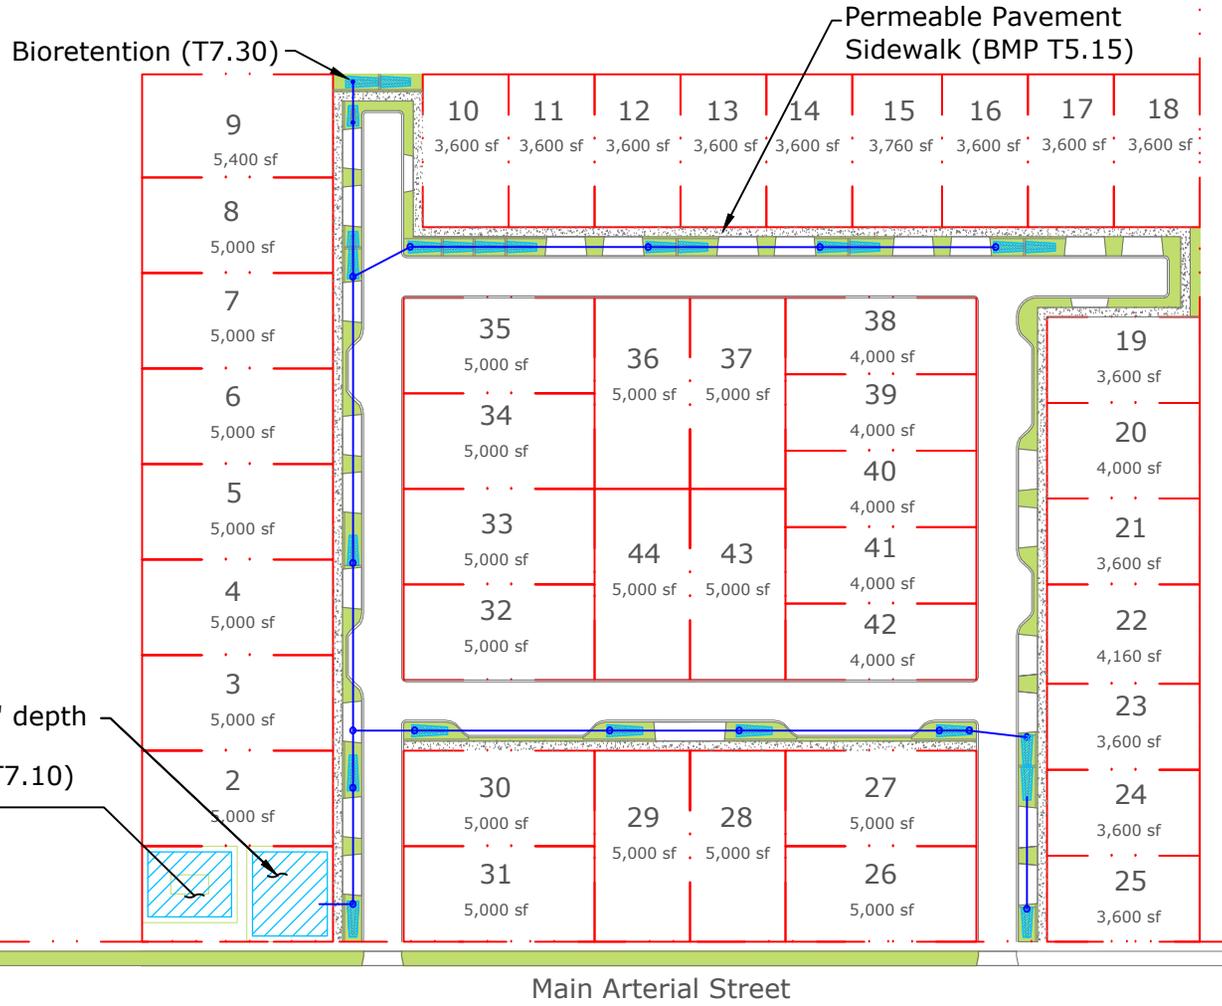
Scenario 5. Permanent Stormwater Site Plan - Typical Single-Family Residential Development, 2012 Requirements with LID Principles, Outwash Soils
